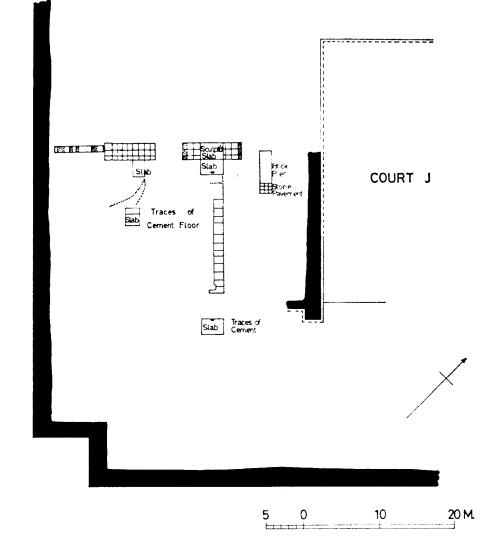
Plan of Thompson's 'New Courtyard' of the North Palace
